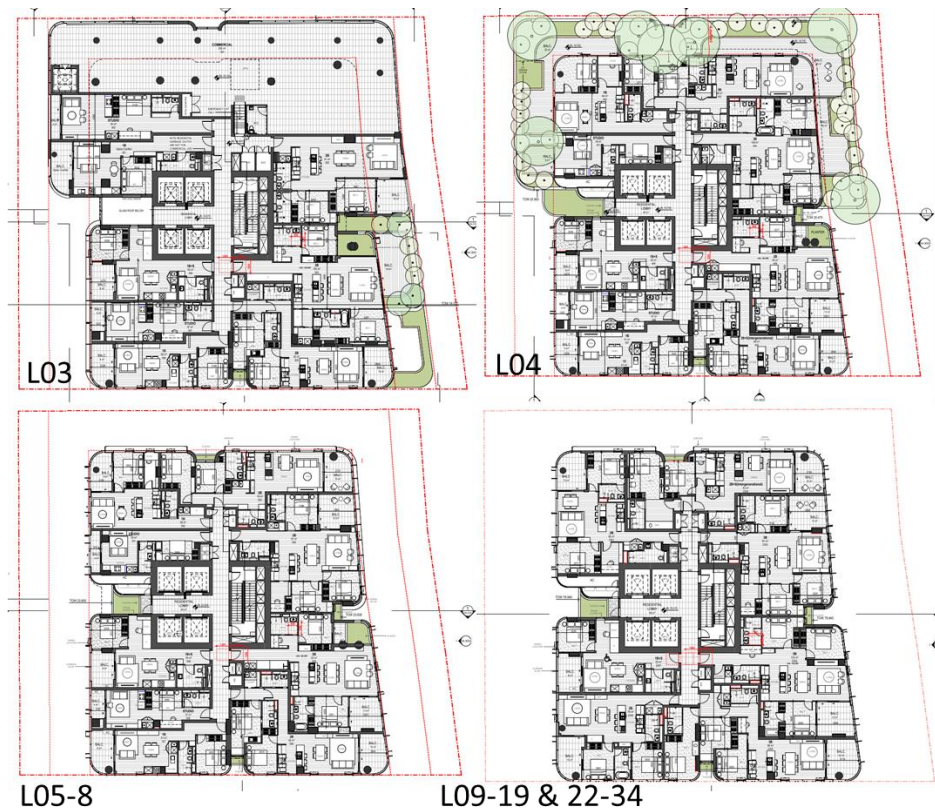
| Proposed Floor Plans (Source: Applicant's Architectural Plans)
